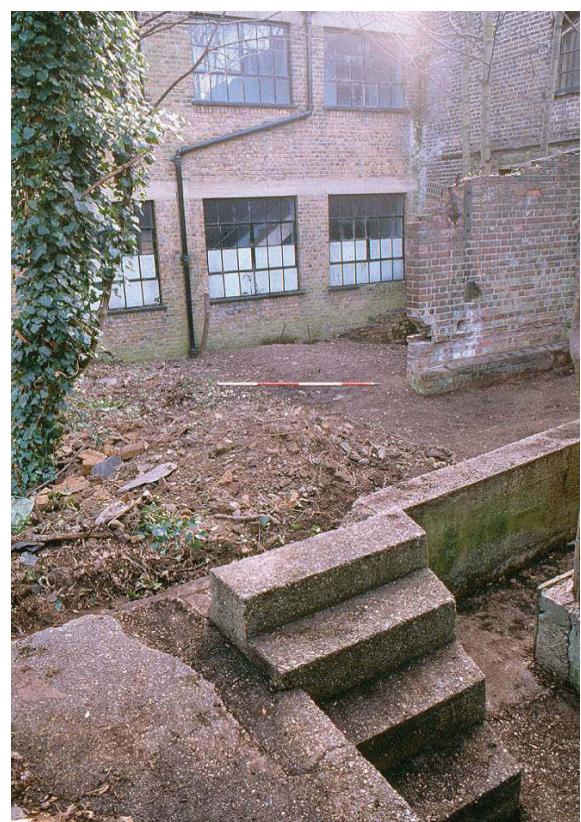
Concrete steps to the former footbridge on the northern side of the millrace
